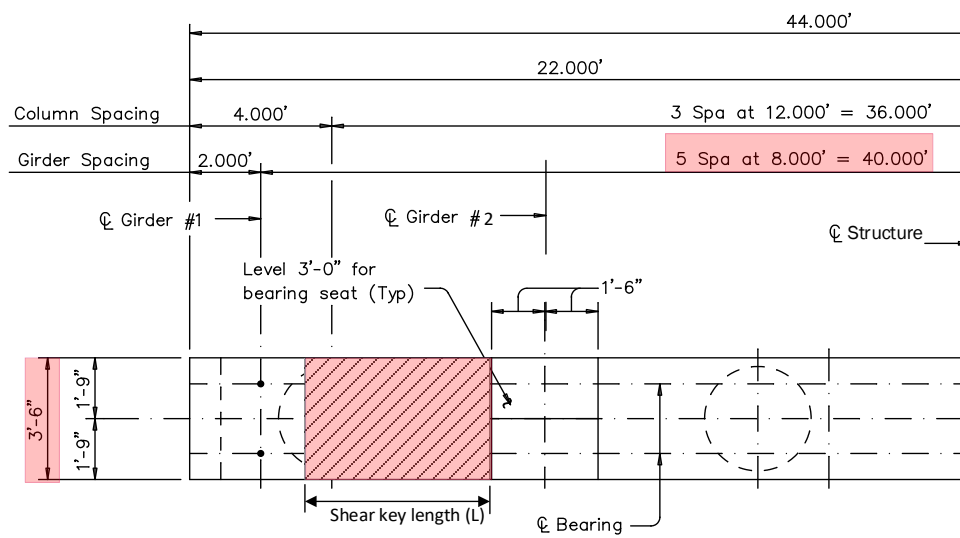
Bent cap for 44-ft roadway I-girder bridge
